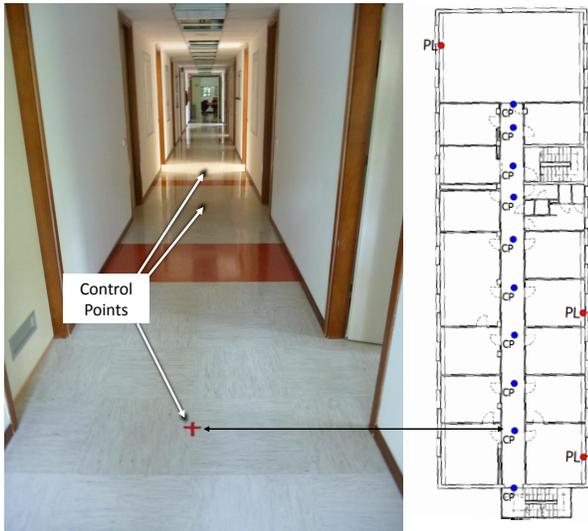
Location of the pseudolites and control points on the first floor JRC building used for the testing.
